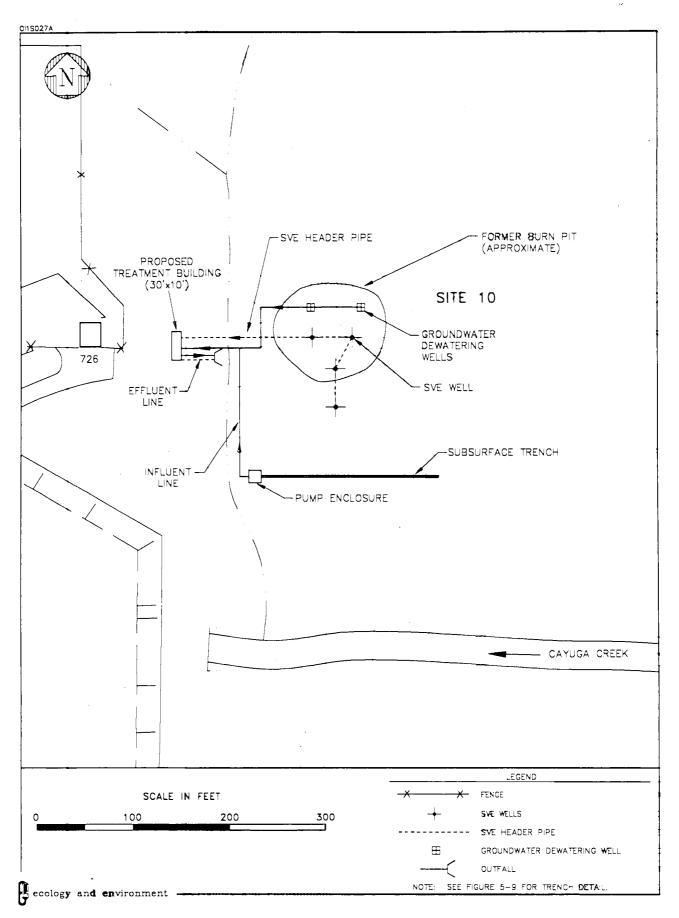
ALTERNATIVE 4 LAYOUT IRP SITE 10 NIAGARA FALLS IAP-ARS 5-97
